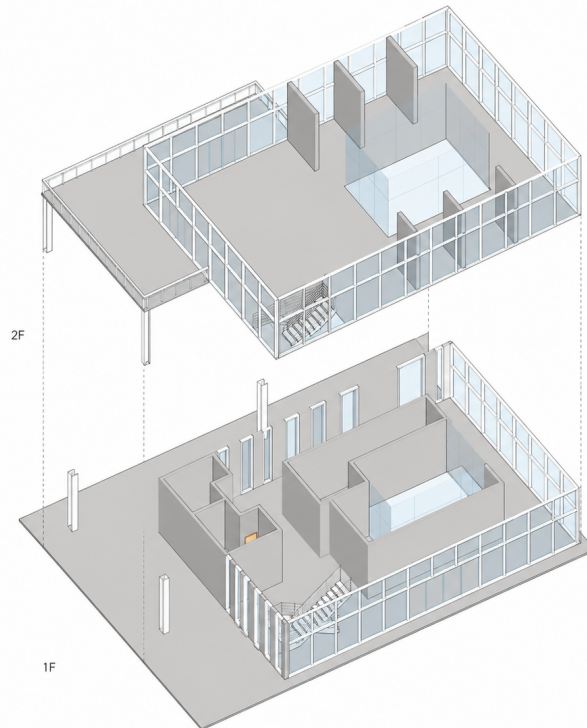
Simplified two-floor model used as the pilot case study. The model provides a controlled environment for testing walkable-space extraction, vertical connection modelling, and 2.5D graph construction.
